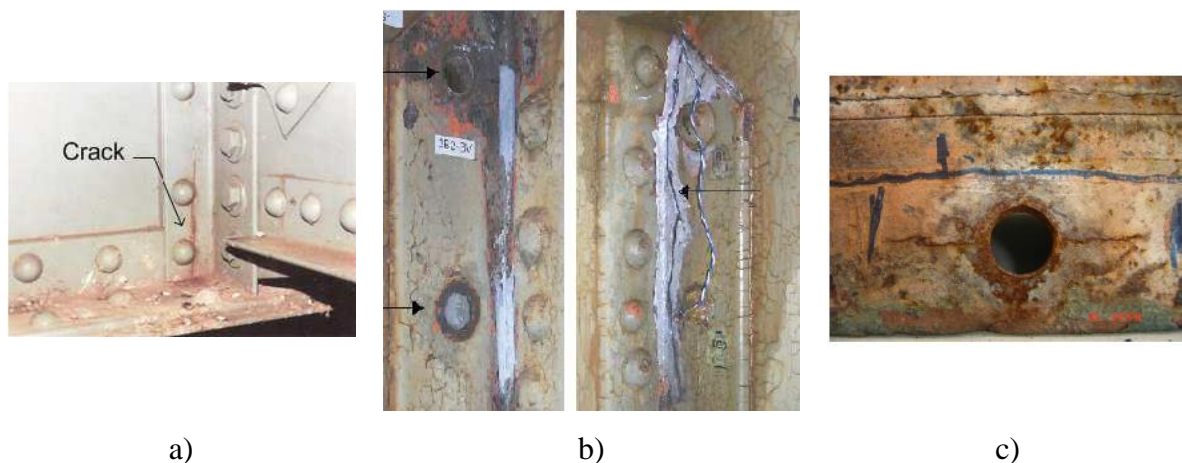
Fatigue cracks: a) in riveted connection between cross-bracing elements [11]; b) in stringer-to-cross-beam connections [11]; c) growing from a rivet hole [13].
